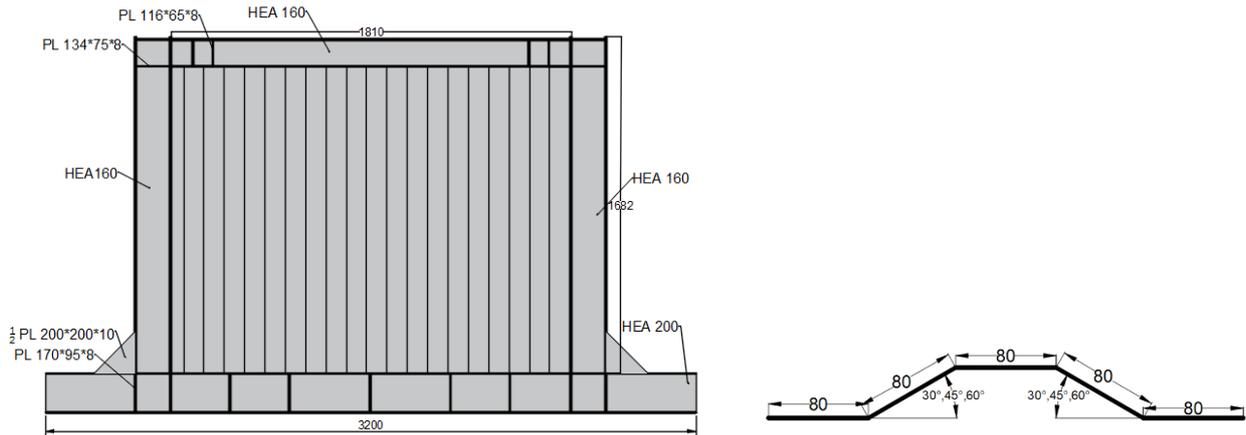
The details of the corrugated plate (mm) and the specimens [9]
